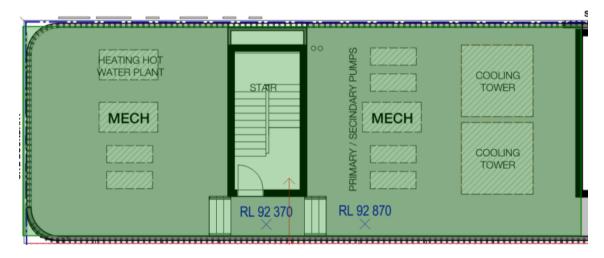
Extent of Roof Mounted Condenser Water Plant
